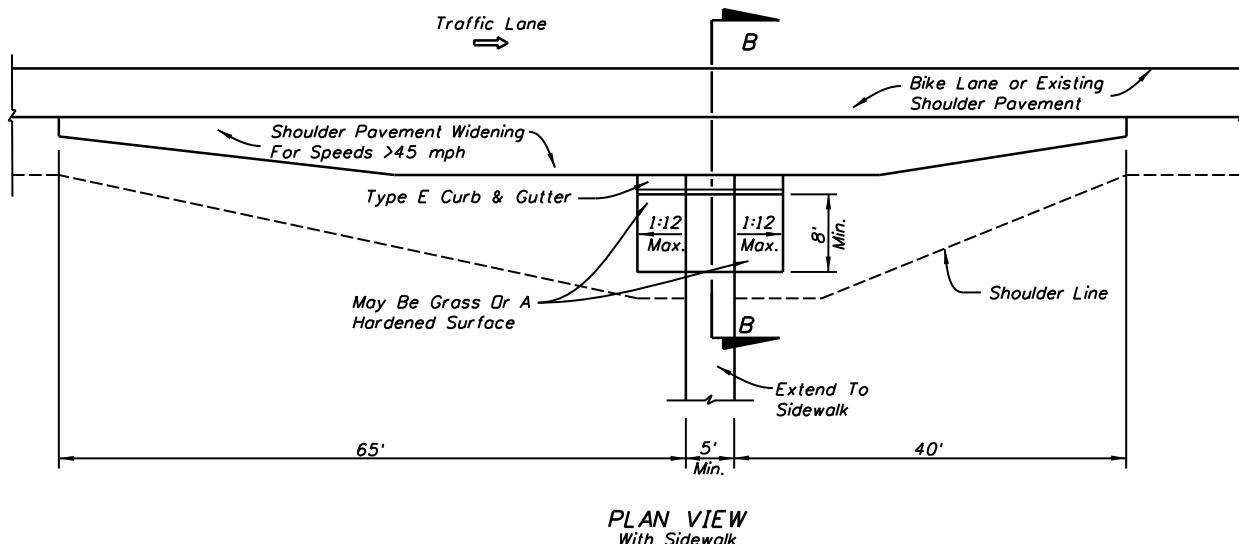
Accessible Boarding and Alighting Area for Flush Shoulder Roadways with Connection to Sidewalk
